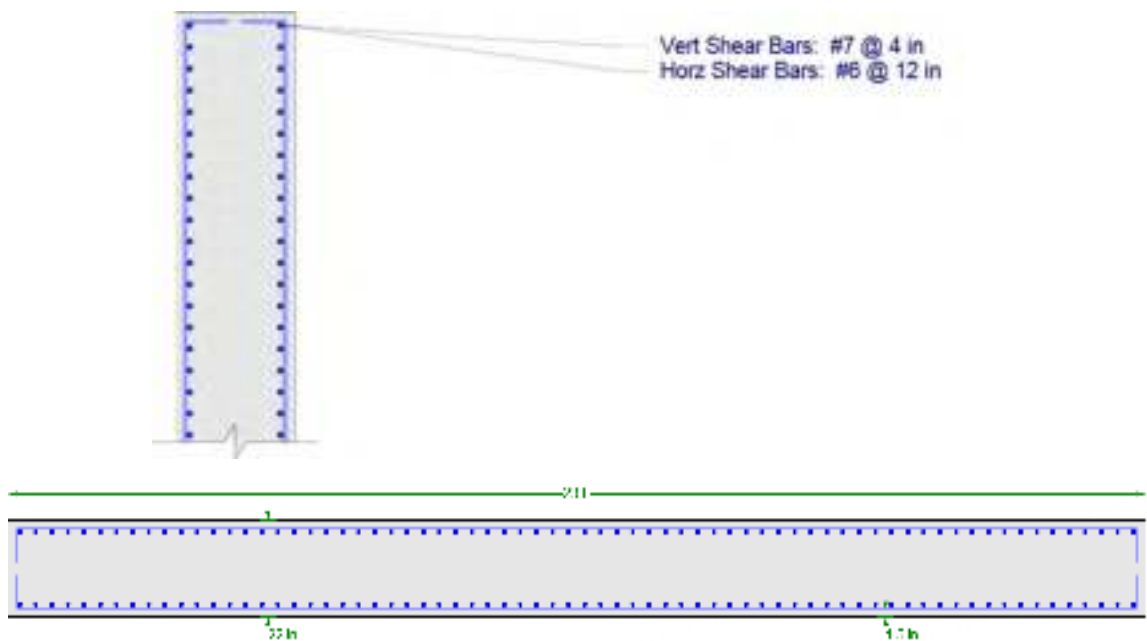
Building (B9-12S-H-S) Special RC Shear Reinforcement Details; Wall Section for Floors 4-6
